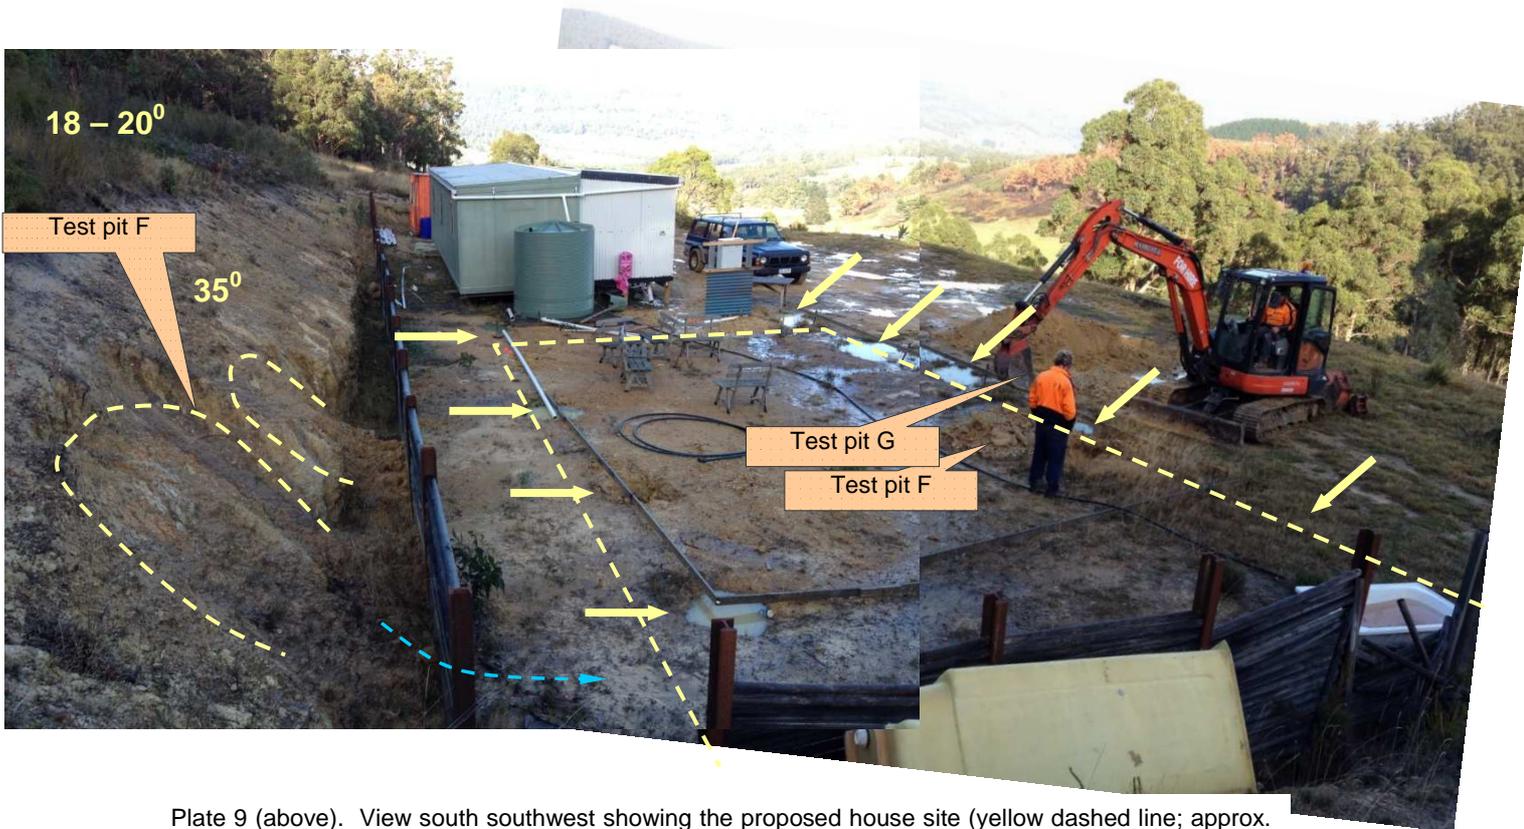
(above). View south southwest showing the proposed house site (yellow dashed line; approx. only), previously-dug auger holes for piers (arrowed), test pits F and G, the steel-posted and undrained timber retaining wall (blue dashed line shows water flow), the 35° batter slope behind, and two very small rotational landslides on the batter face.
